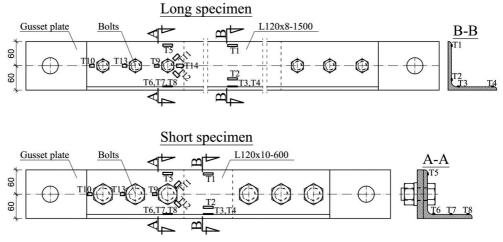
Arrangement of strain gauges on specimens (strain gauges T1÷T14)
